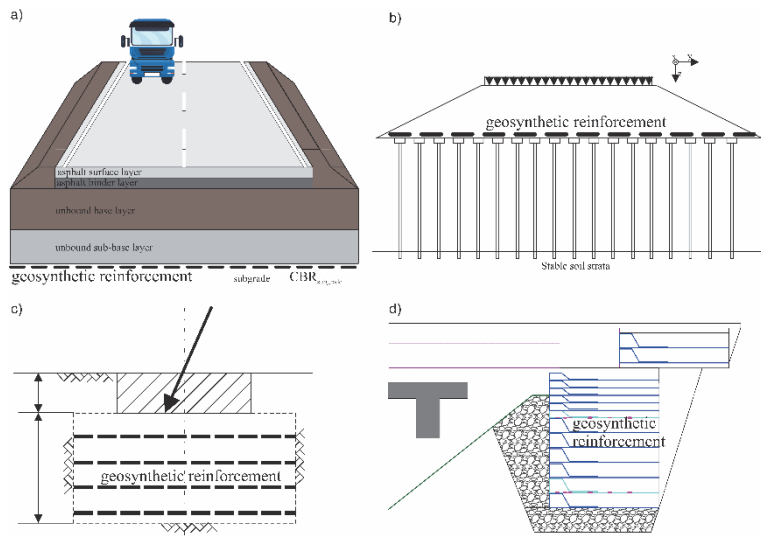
Case studies of the cost effectiveness of geosynthetic-reinforced soil structures: a) flexible pavement, b) pile embankment, c) reinforced pad foundation, and d) GRS bridge abutment.
